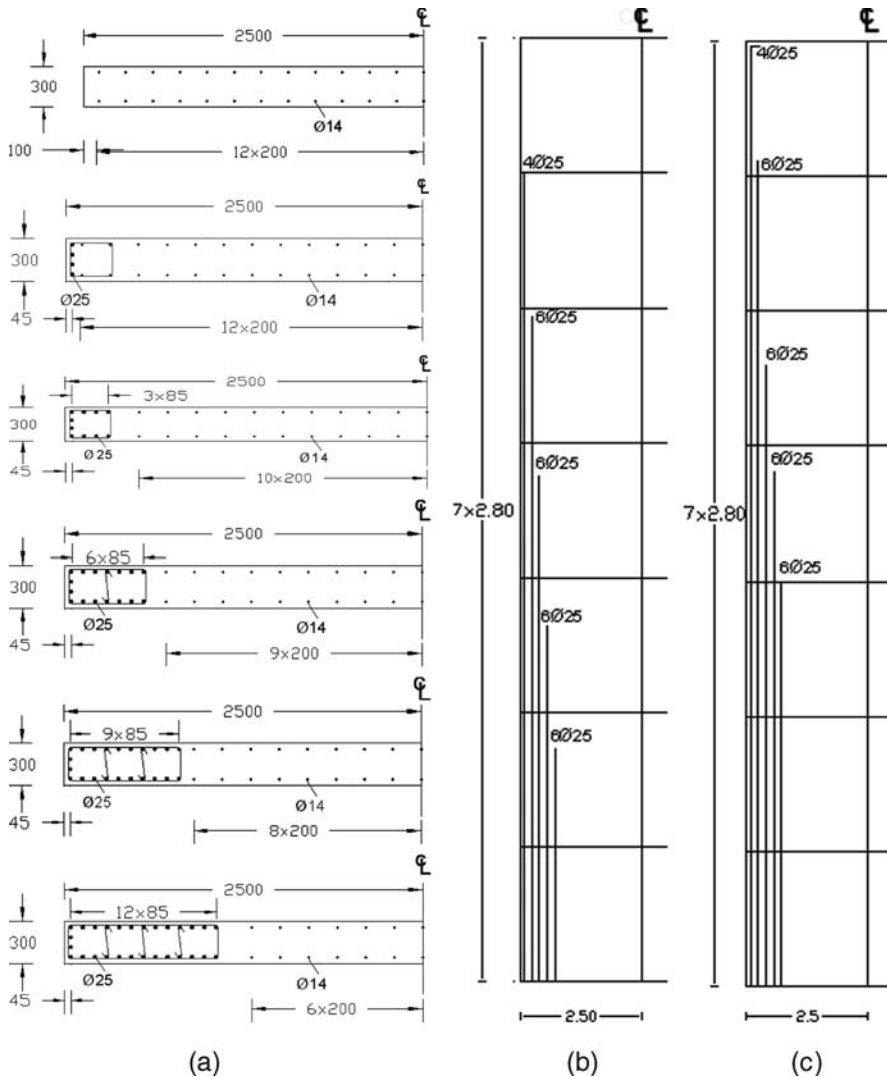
Vertical wall reinforcement in one (symmetric) half of the wall for the two values of cot δ : layout of vertical bars in wall section (a); curtailment of vertical bars for (b) cot $\delta = 1$; (c) cot $\delta = 2.5$
